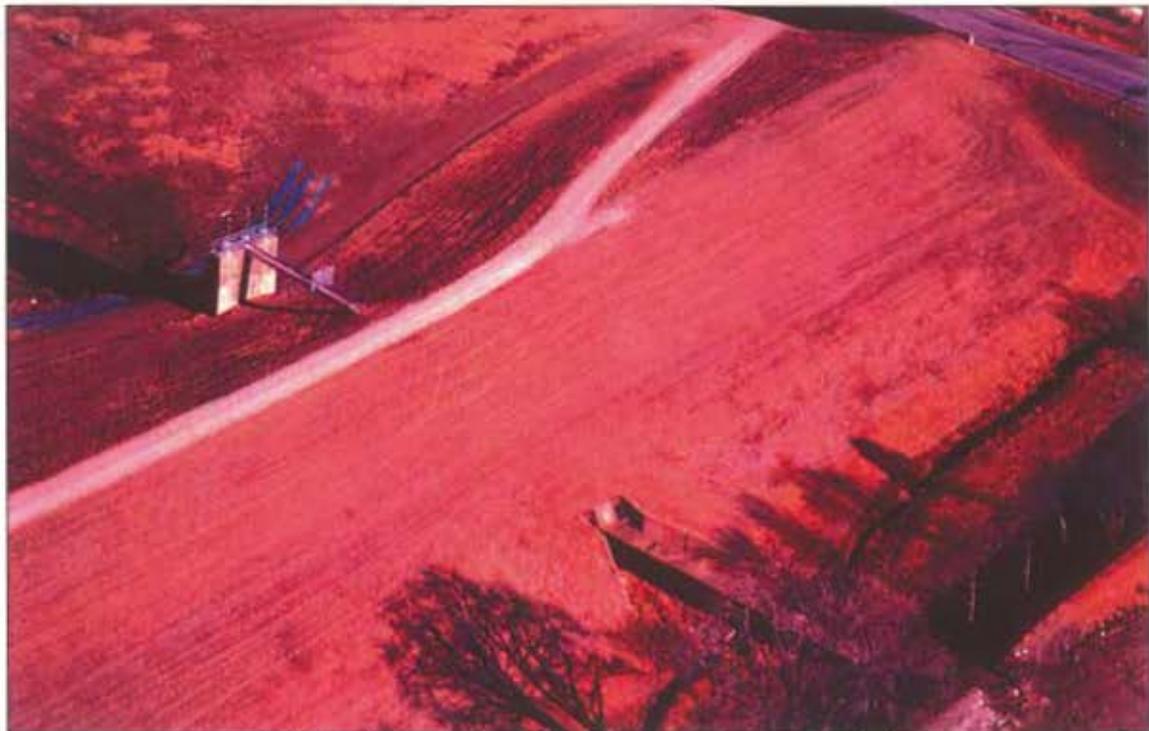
Lake Cliff Pressure Sewer Outfall
